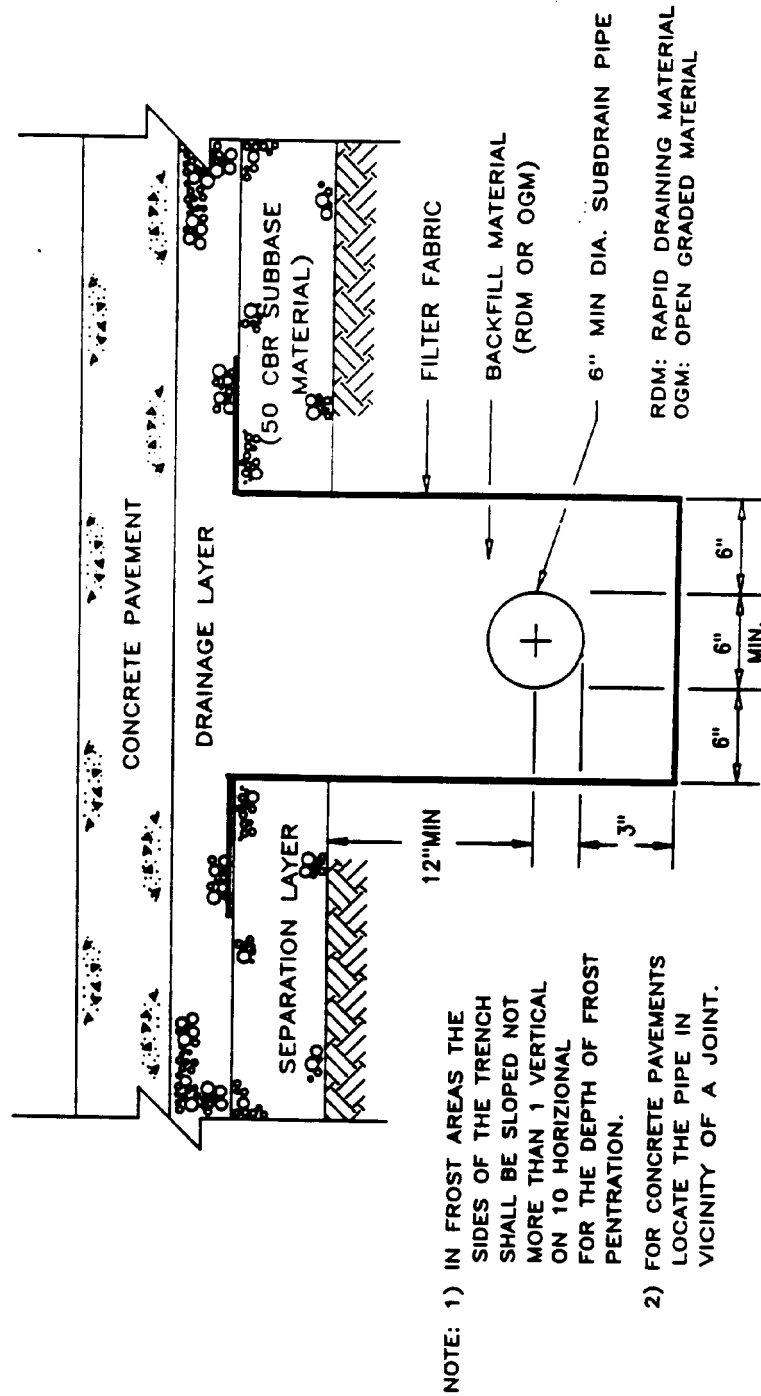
Typical Concrete Pavement Interior Subdrain Detail
